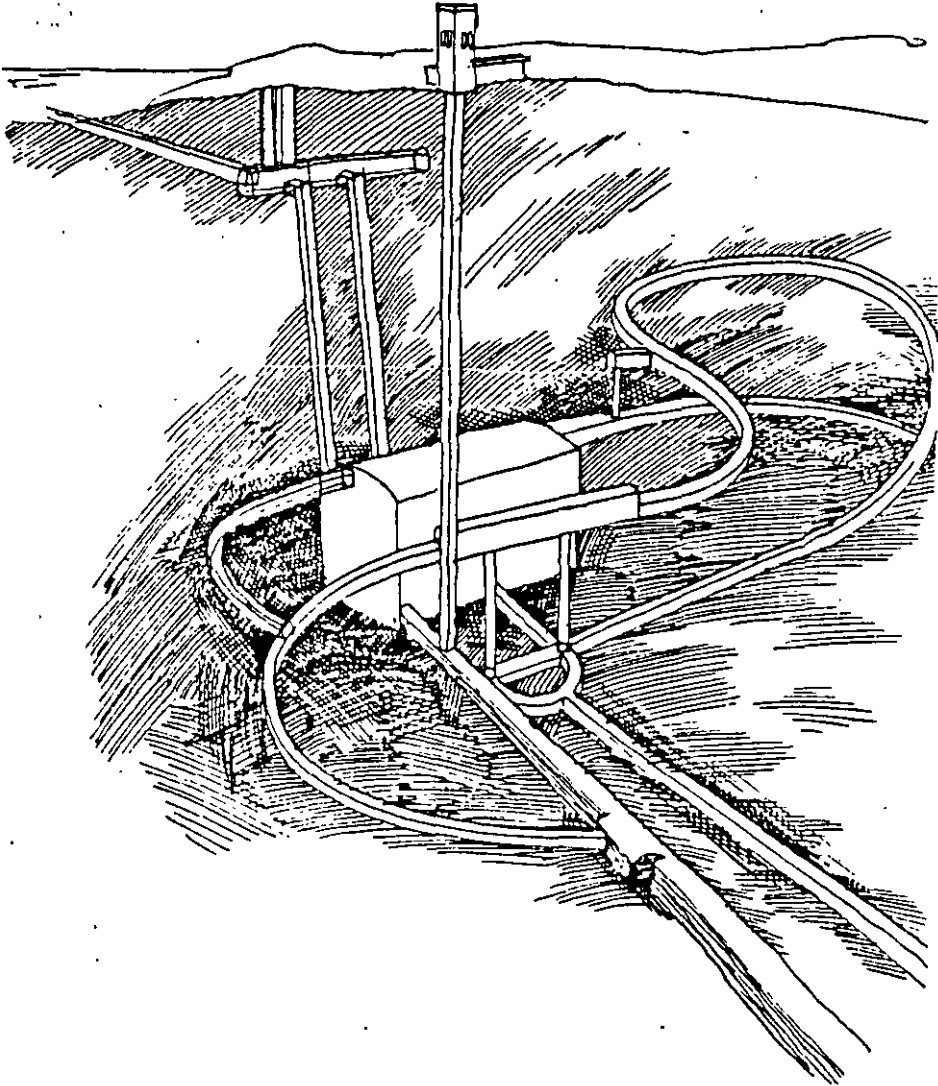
Typical tunnel system in a hydroelectric power plant.
